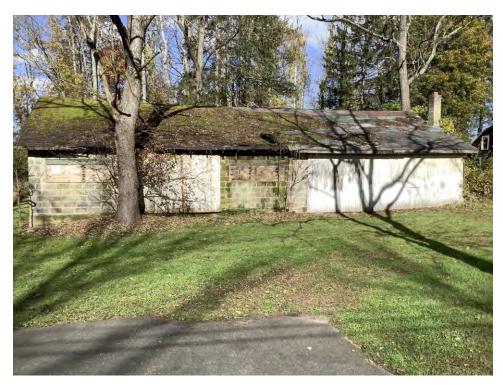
Photograph of 248 Stickles Road, Building #1, facing north.
